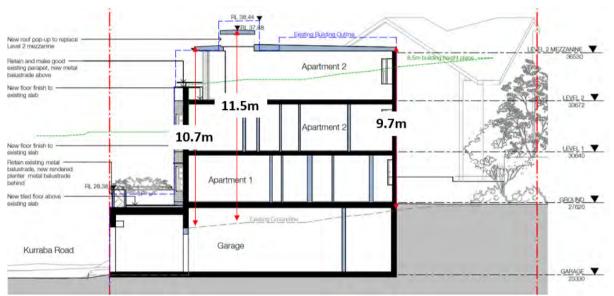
Annotated Section A detailing various building heights, DA-1501 Rev 19
